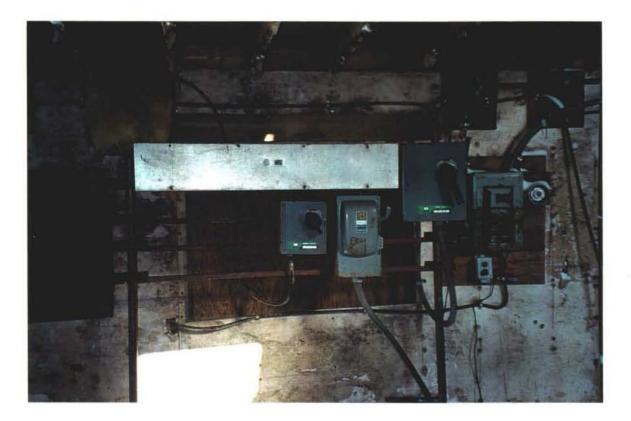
Keno No. 9 Electrical panel inside Building 36A.
